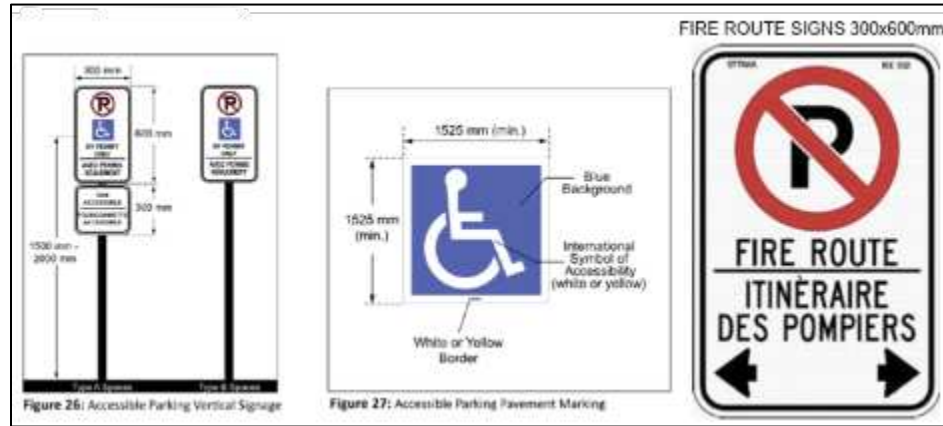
Example of site plan sign details for the accessible parking and fire route signs.
